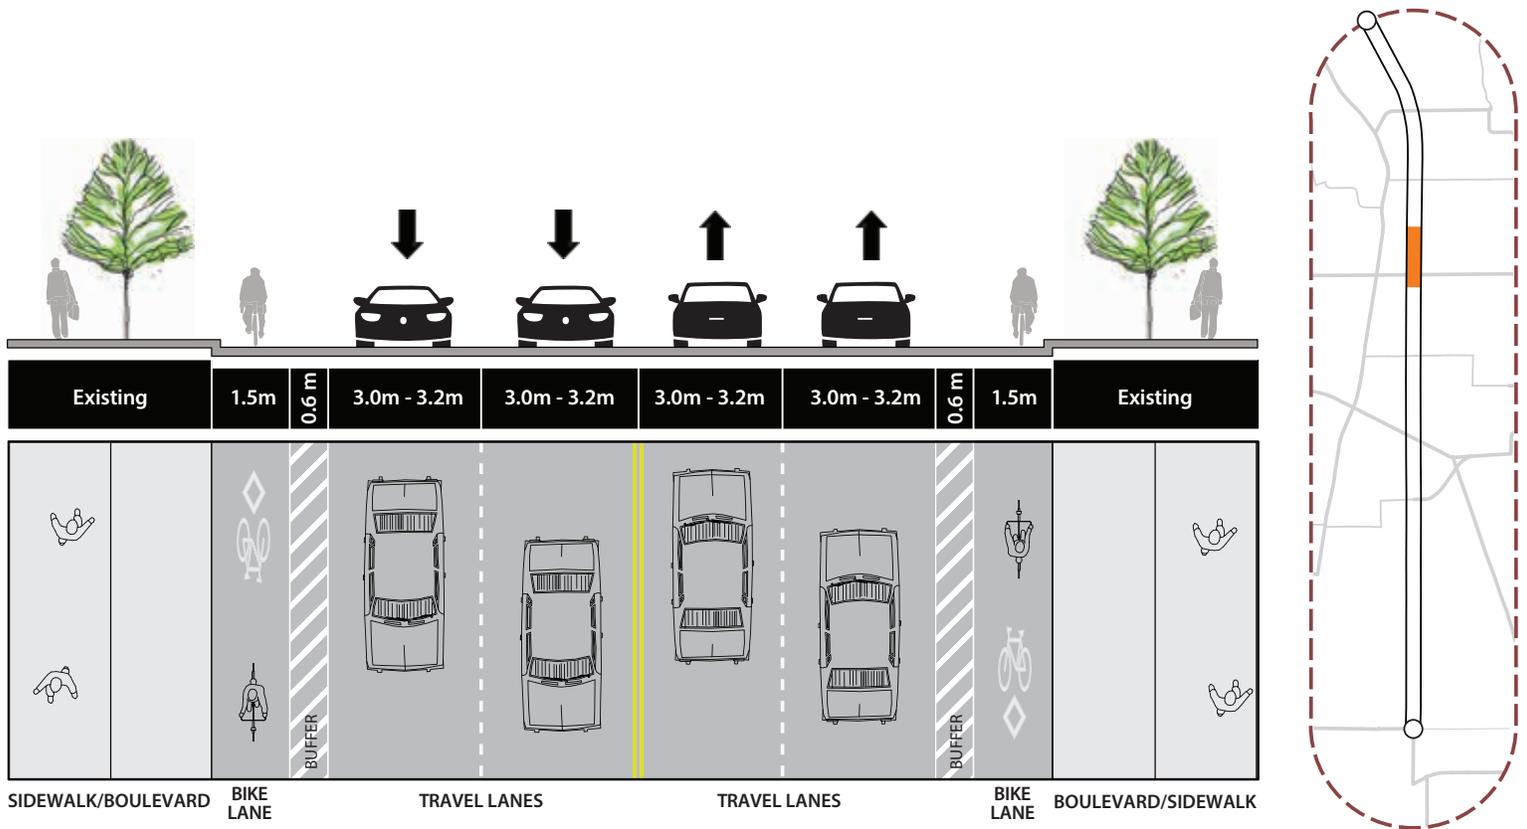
| Conceptual Shelbourne Street cross section, Garnet Road to North of McKenzie Avenue
